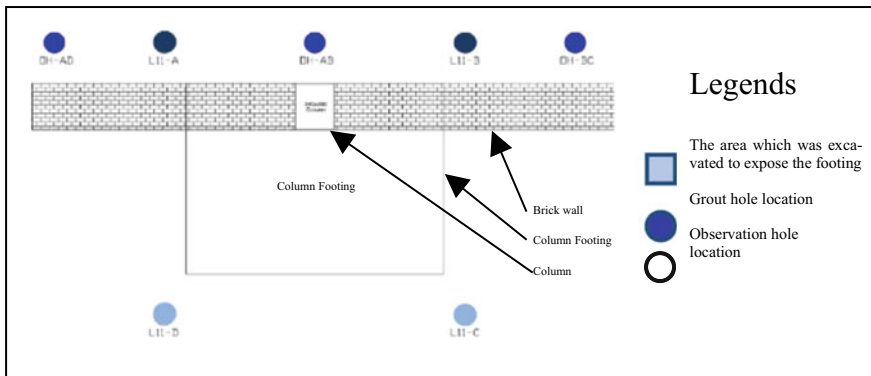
Grout hole and observation hole locations of perimeter footings (plan view)
